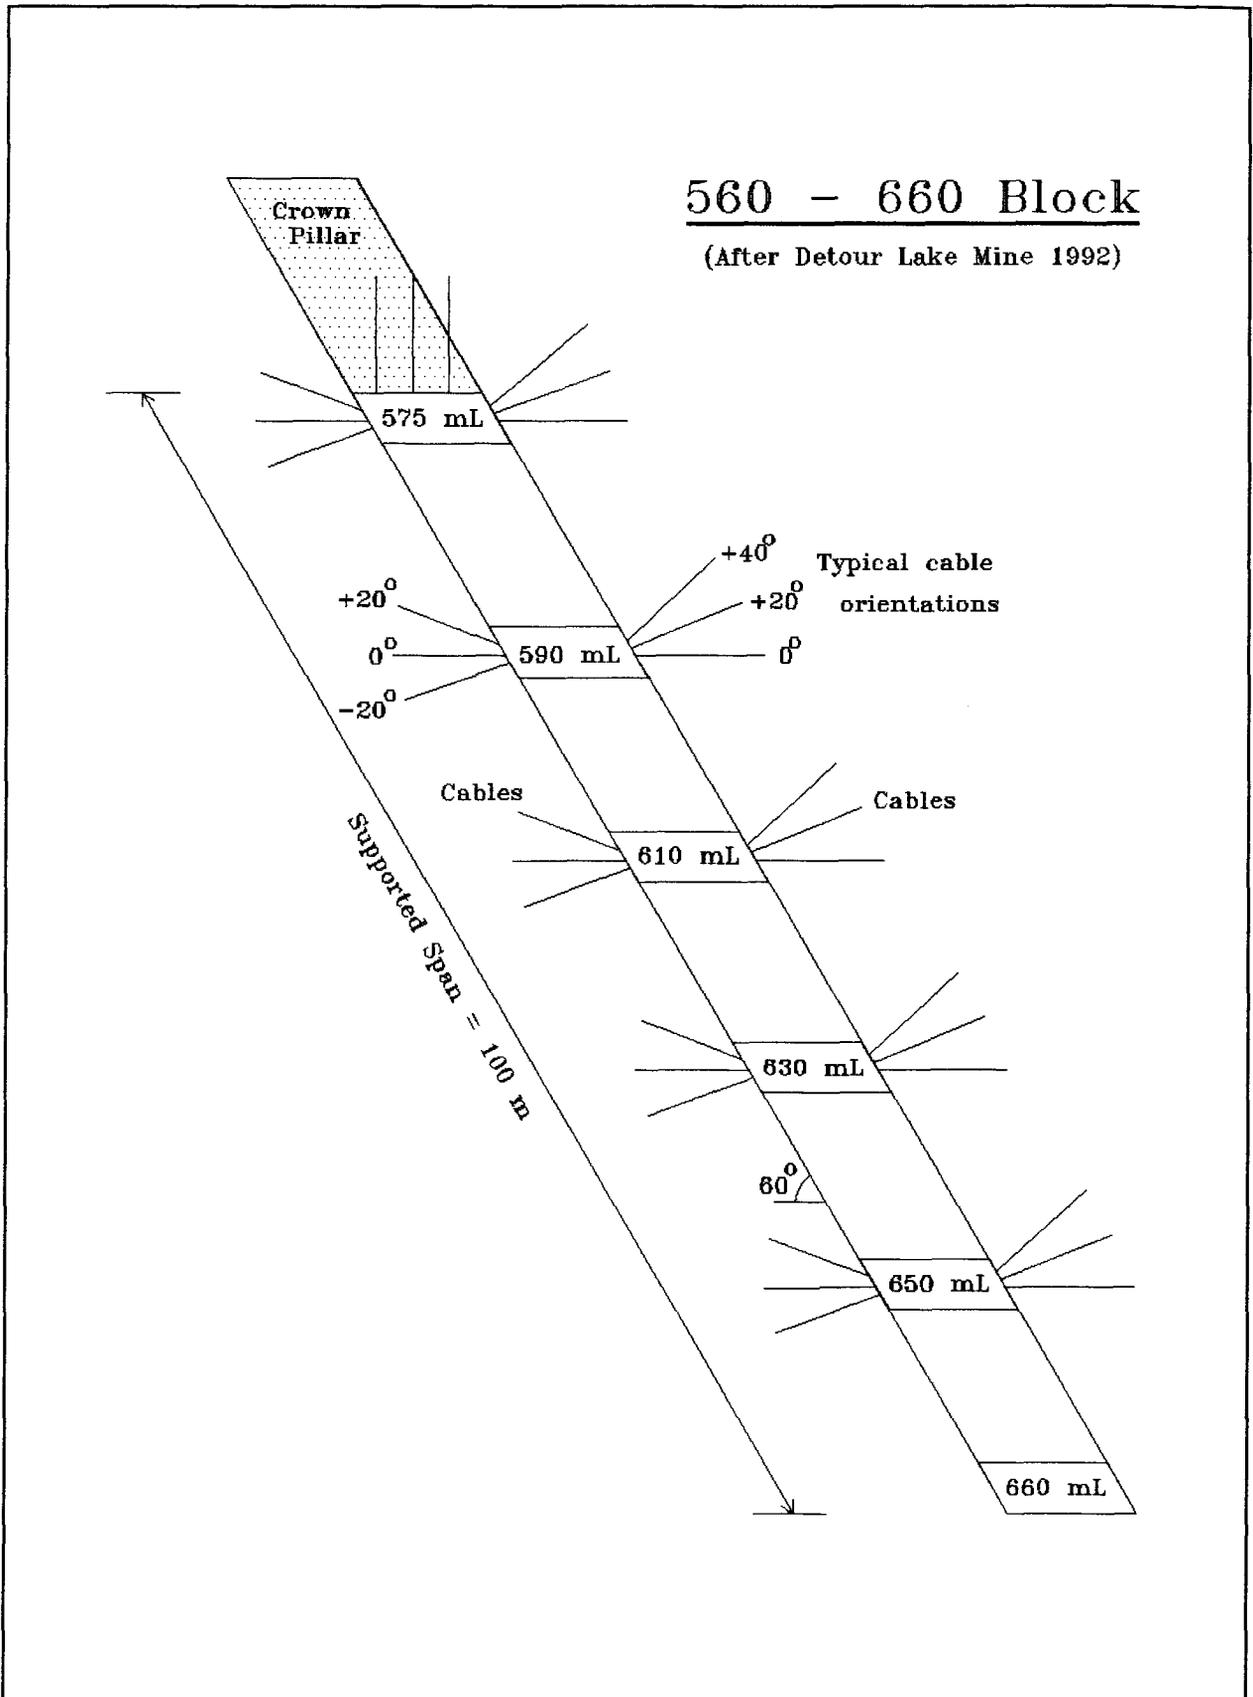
Detour Lake Mine case history of point anchor hangingwall cable support
